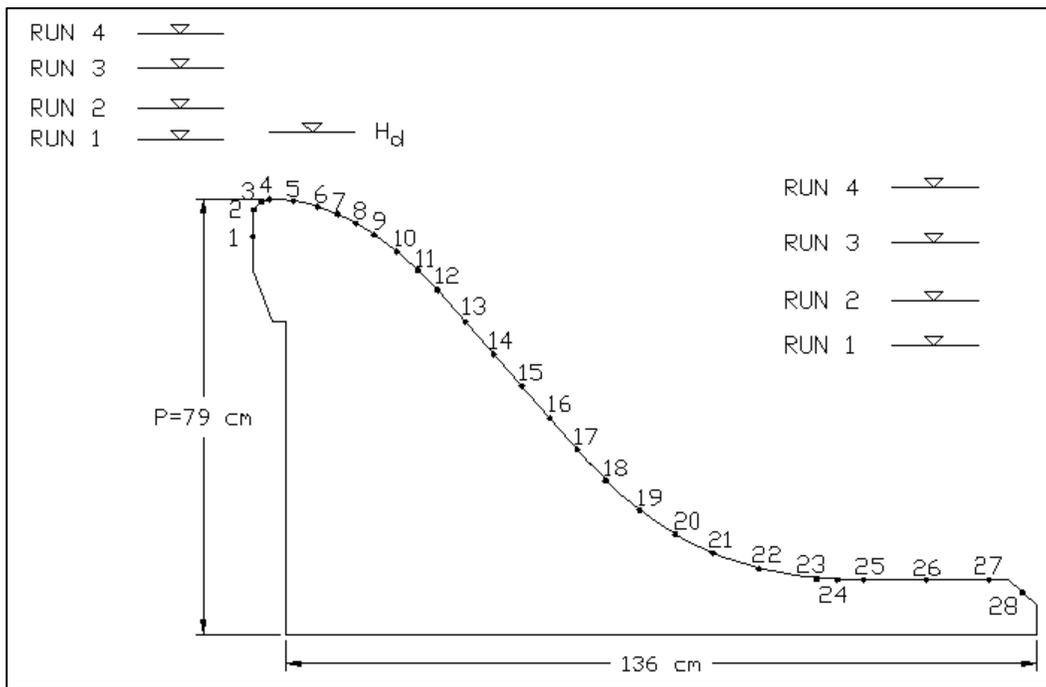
Profile of model B showing the shape, dimensions, pressure tap locations, and headwater and tailwater elevations.
